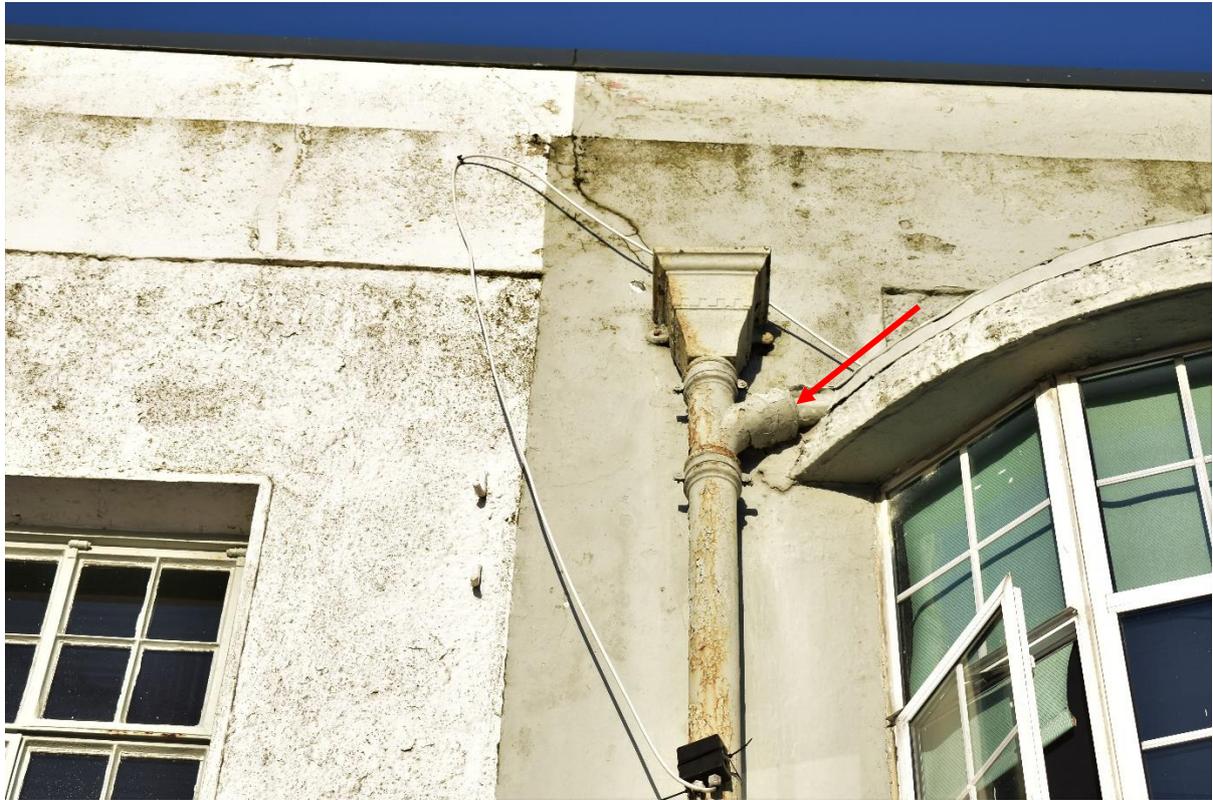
Showing the hopper/downpipe detail at the southeast bay. The bay window outlet is leaking.
